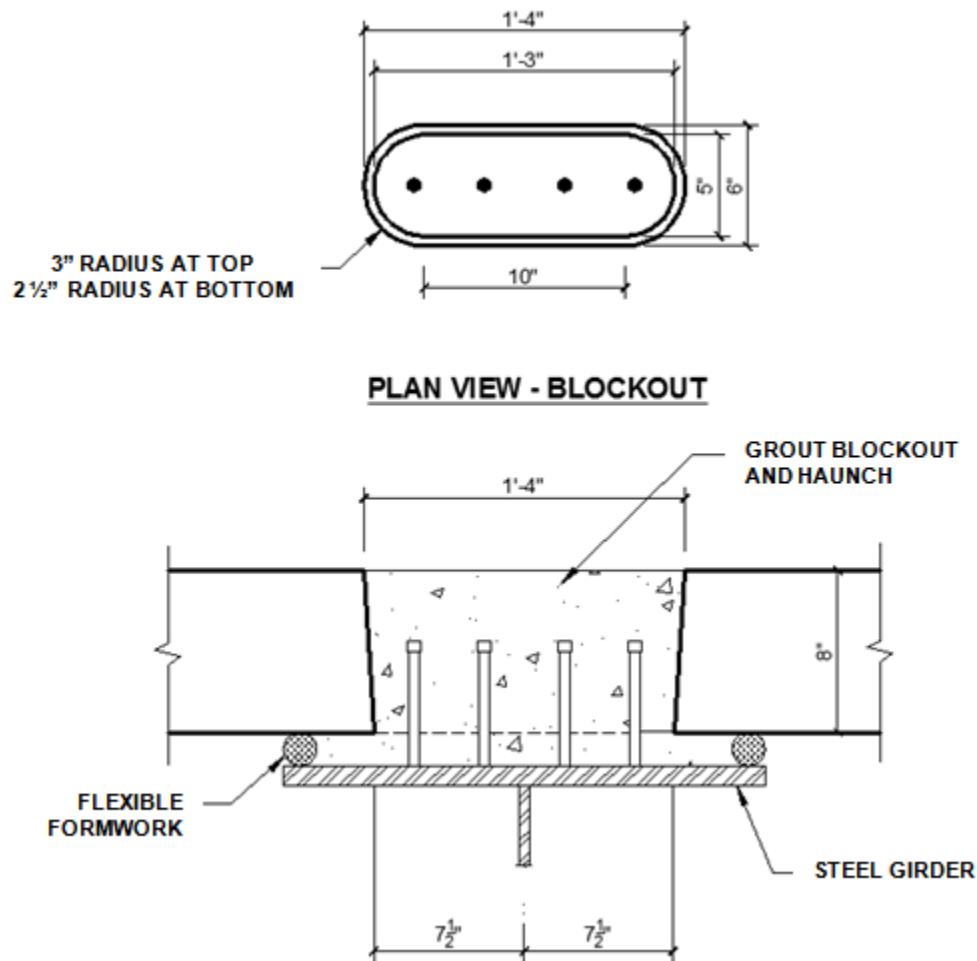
Panel to steel girder connection details (Source: Culmo 2009)
